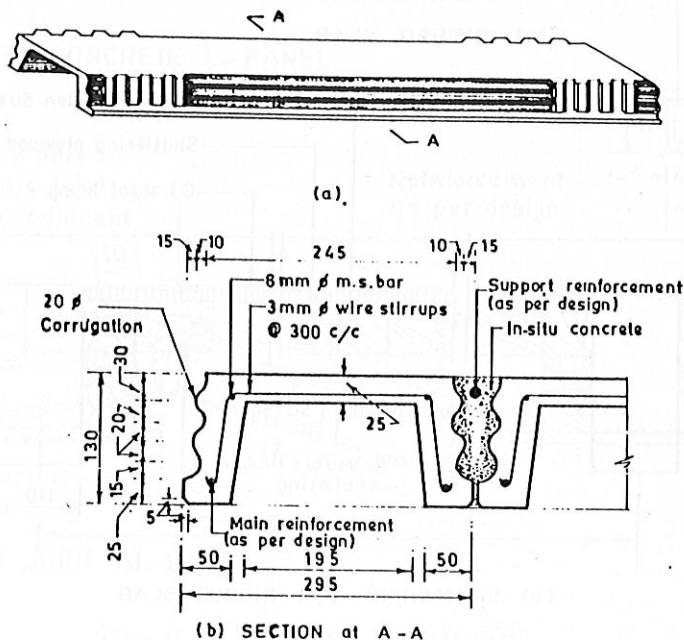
PRECAST CONCRETE CHANNEL UNIT
